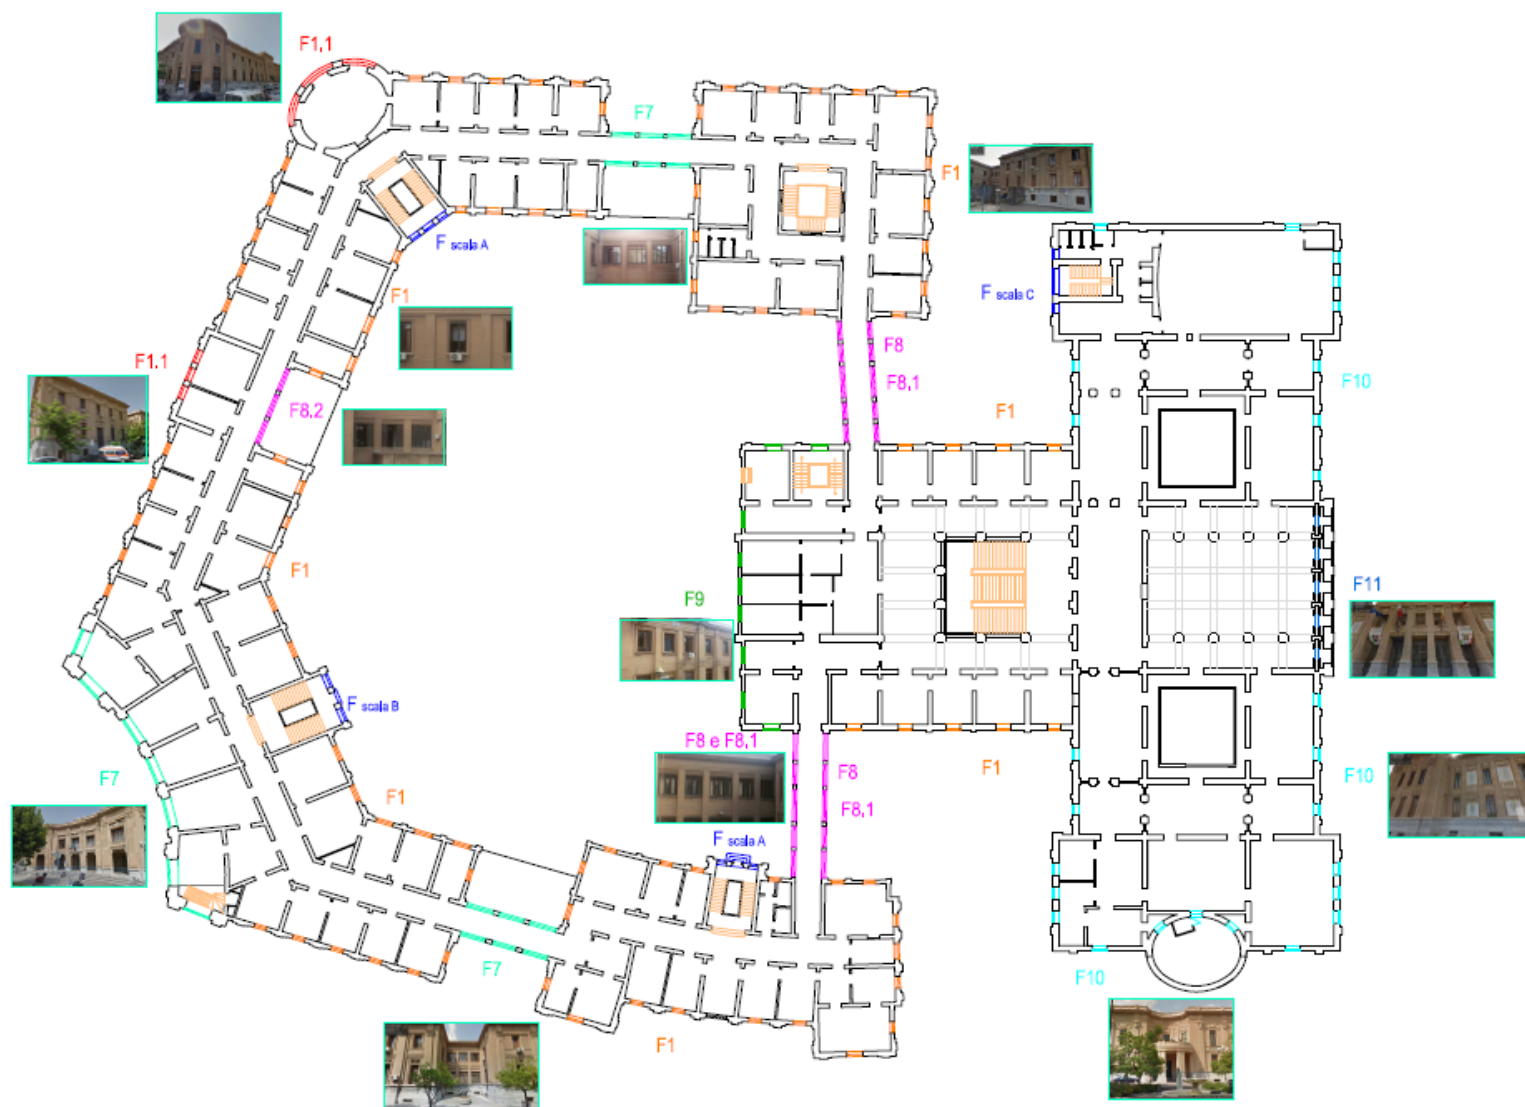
FIRST FLOOR PLANT OF WINDOWS
